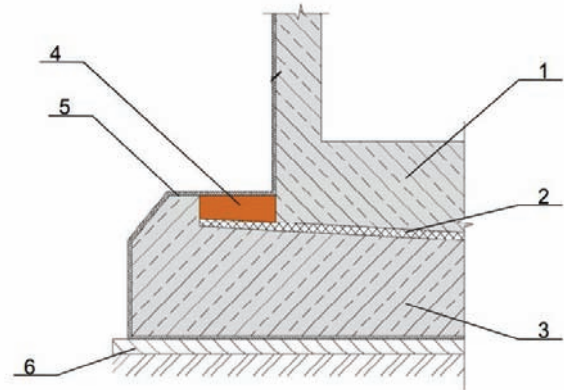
Scheme of seismic isolating sliding belt: 1) lower part of the building at foundation level 2) fluoroplastic plates 3) foundation 4) damper (coarse sand) 5) waterproofing 6) concrete layer
